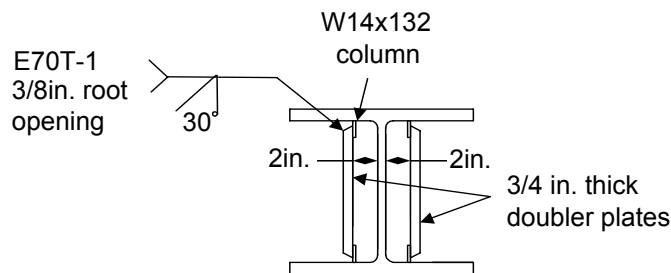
Box detail with doubler plates welded to column flange away from web with CJP welds
